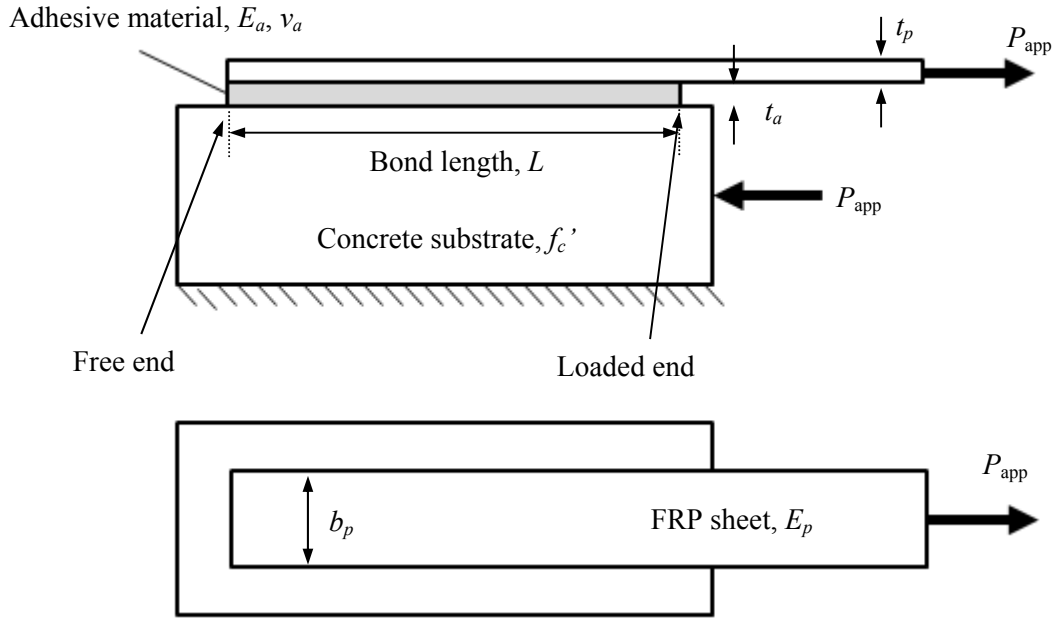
Sketch of Single Pull-off Test for FRP to Concrete
